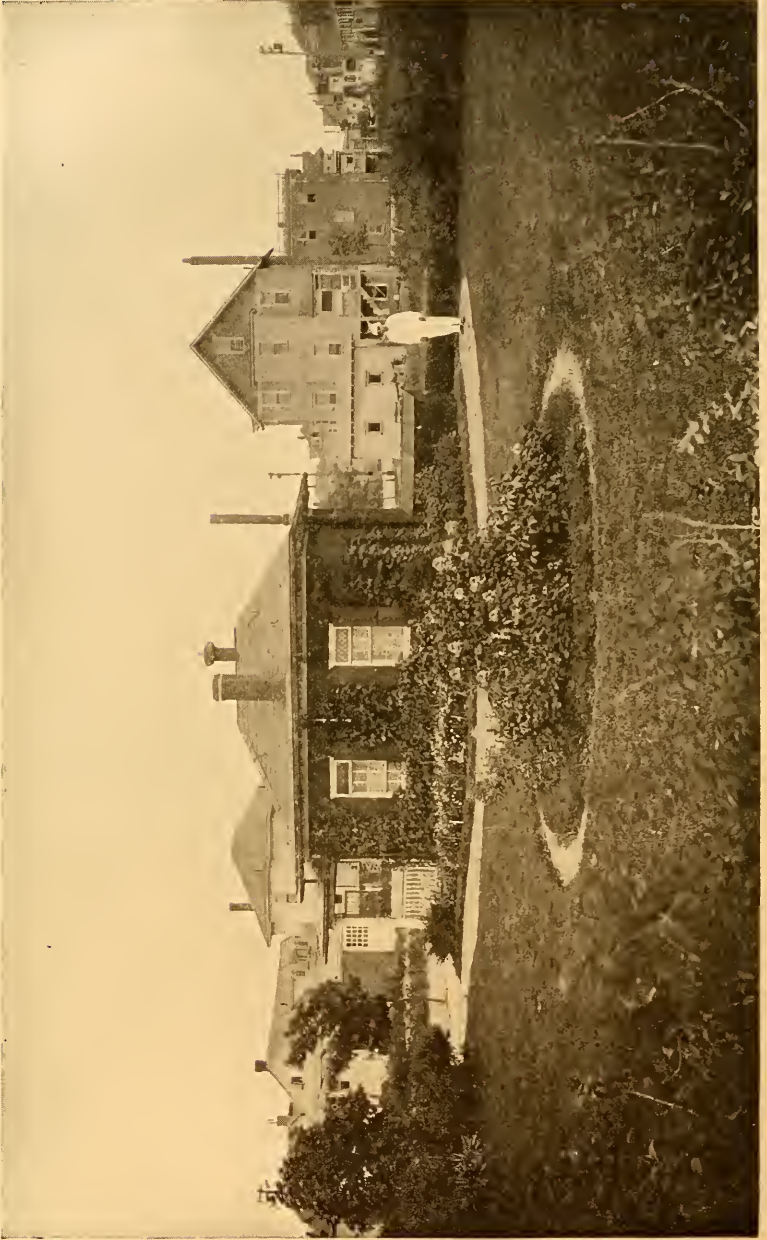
An Example of a Sewage Treatment Plant made Attractive by Landscape Gardening, Raleigh Avenue, Atlantic City (courtesy of C. G. Wigley).
